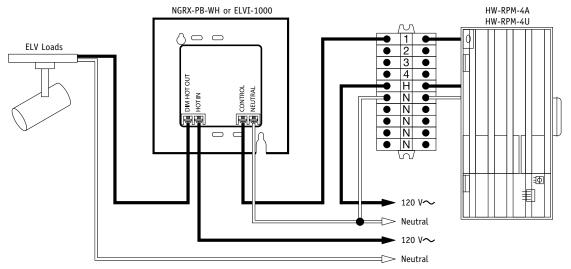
NGRX-PB-WH or ELVI-1000 Installation with Remote Power Modules
